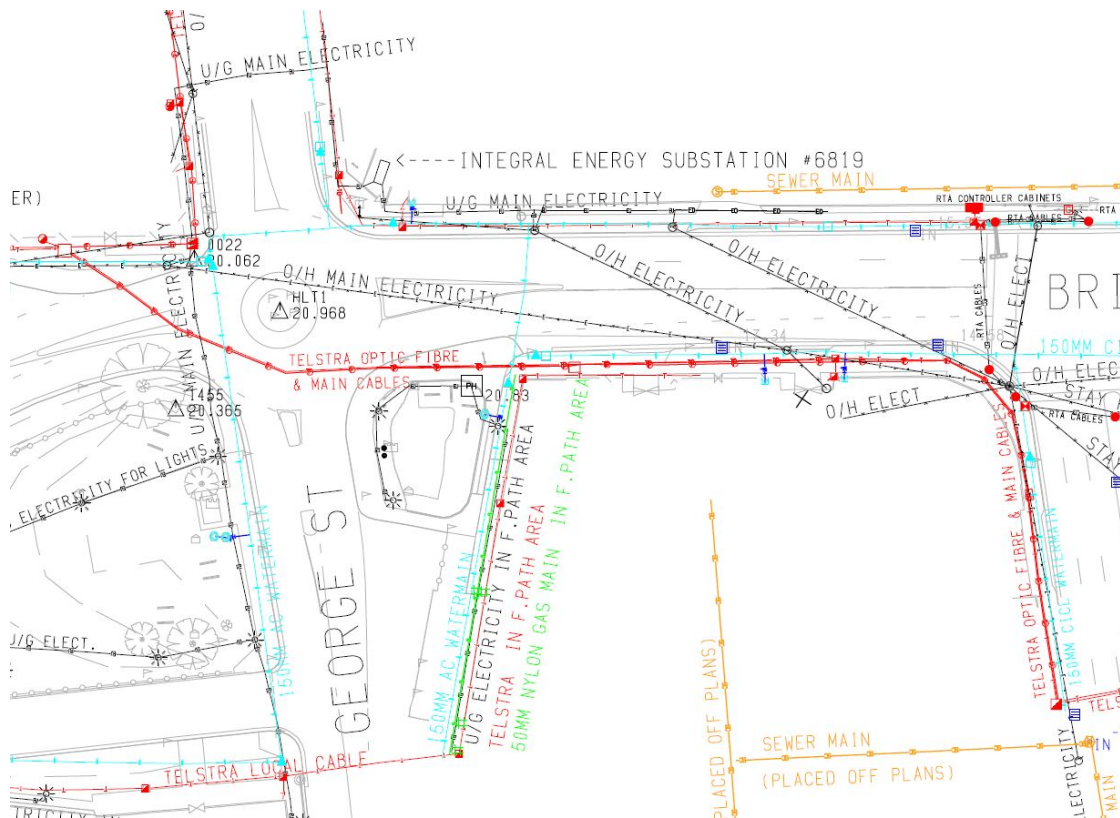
A detail of the 2005 utilities plan in the location of the Bridge Street/George Street roundabout to Macquarie Street.⁵⁷⁴
